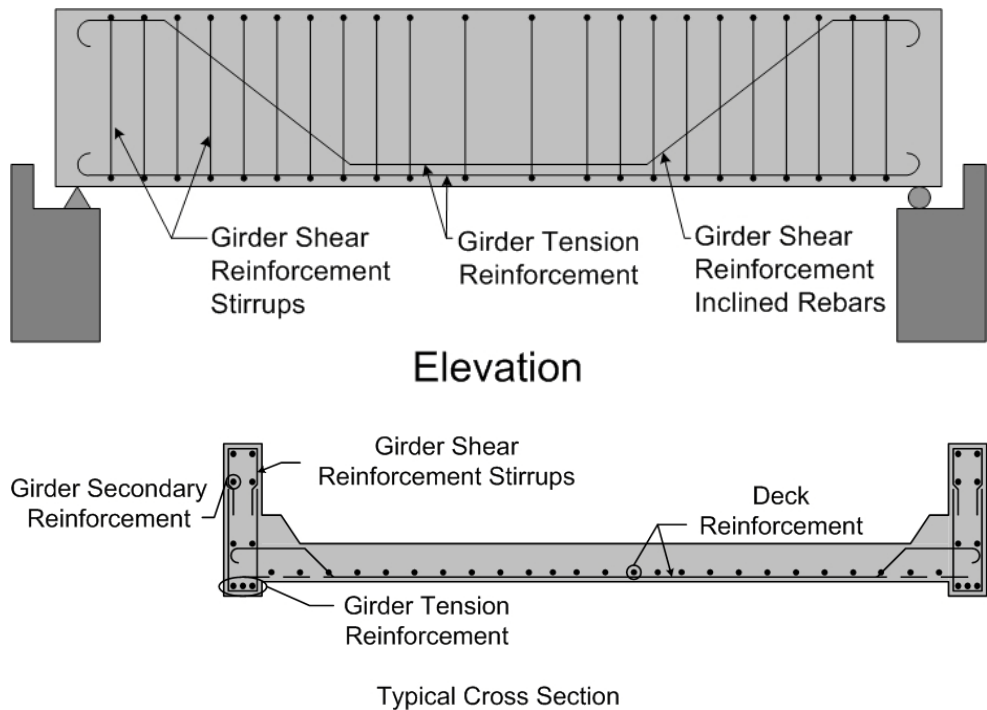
Steel Reinforcement in a Concrete Through Two-Girder
